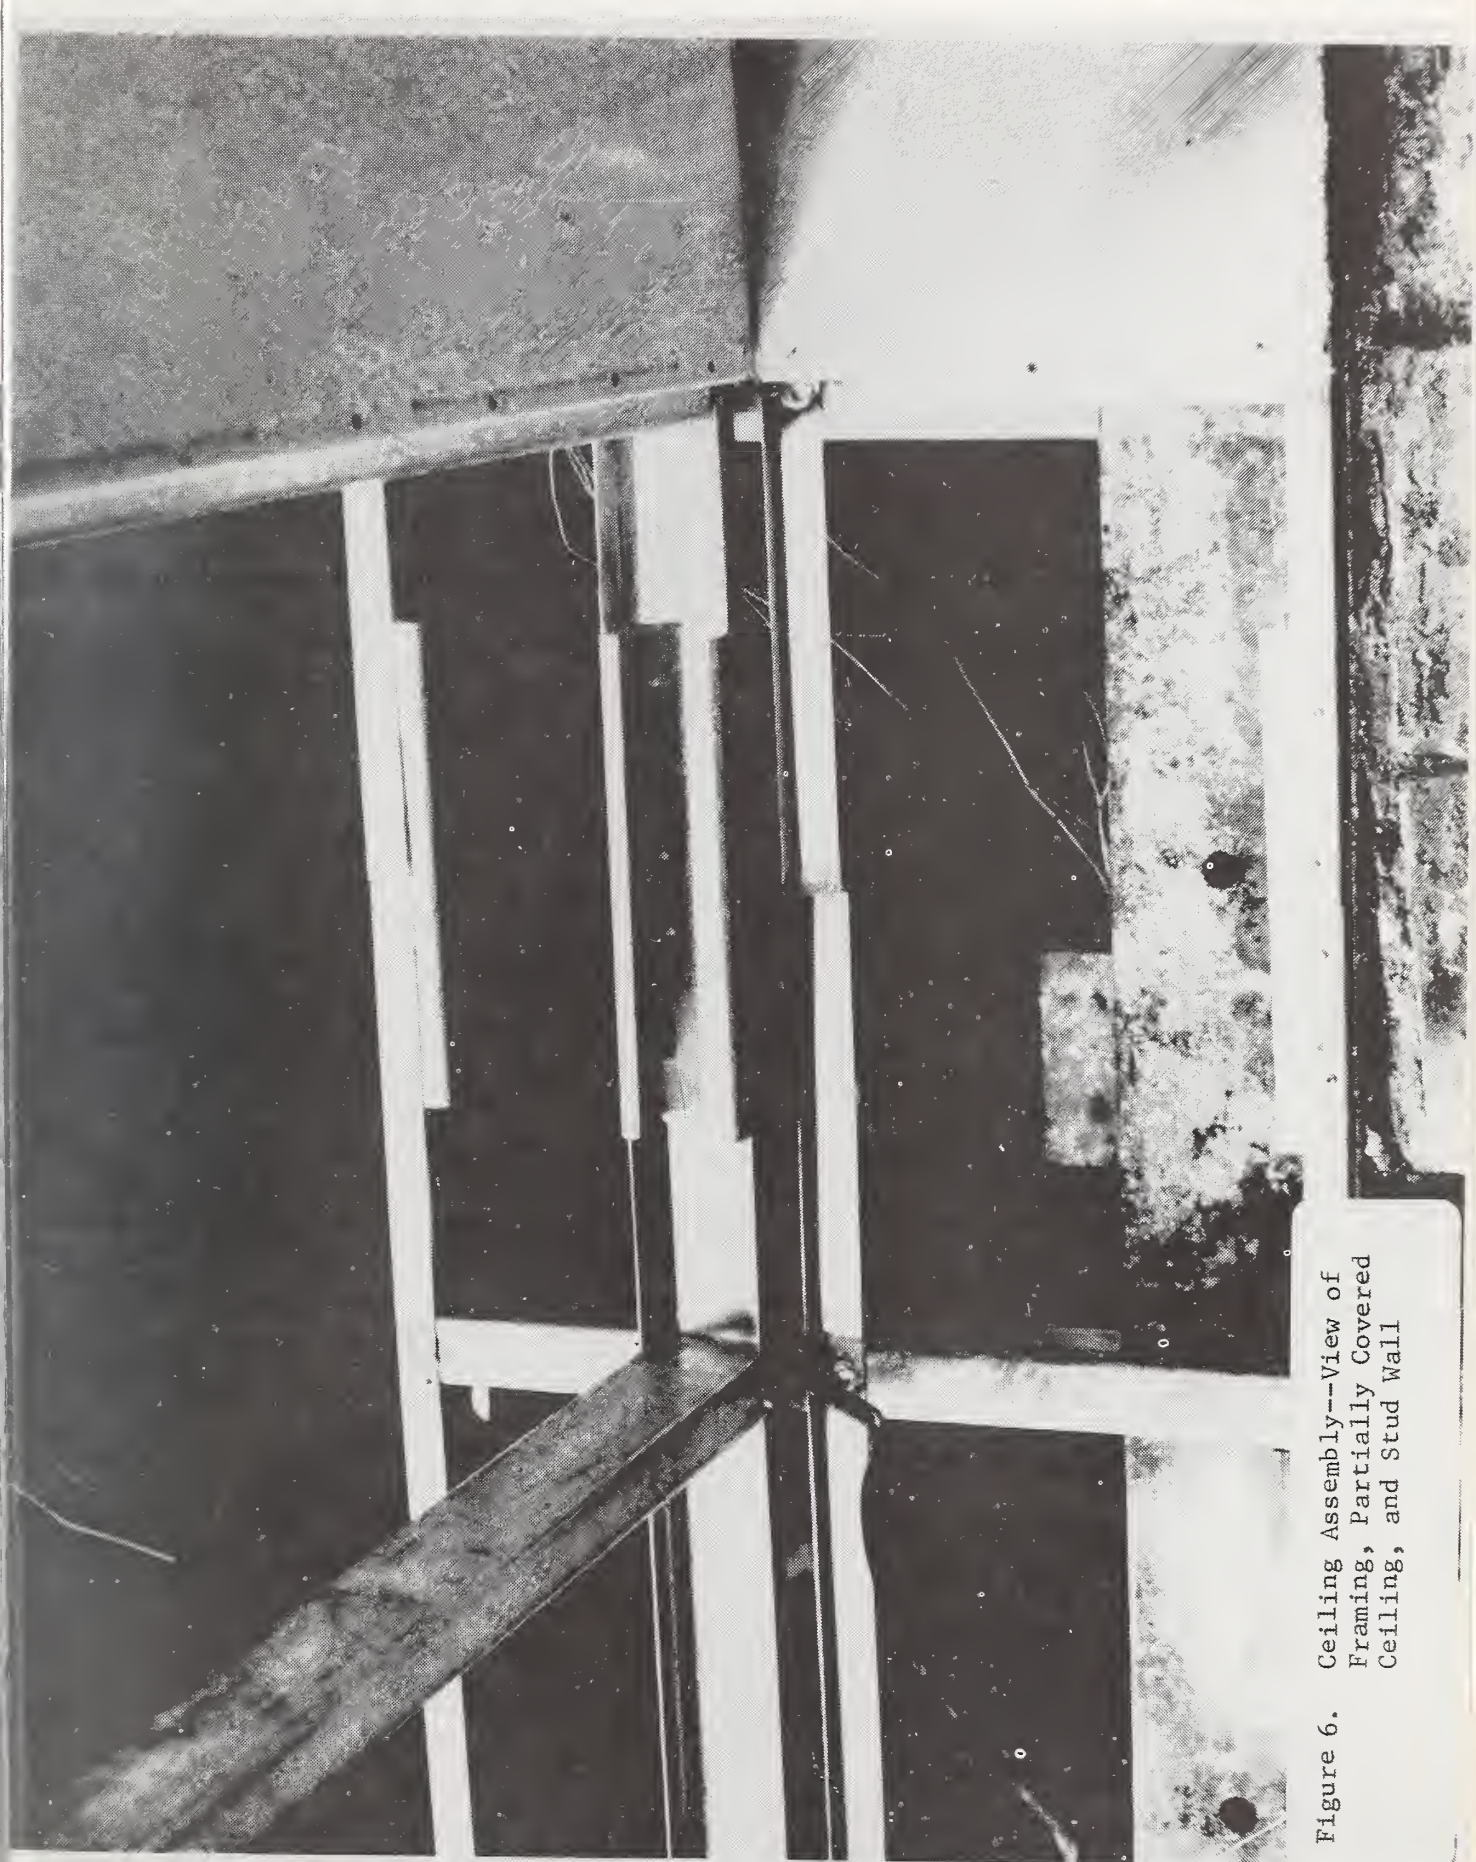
Ceiling Assembly--View of Framing, Partially Covered Ceiling, and Stud Wall
